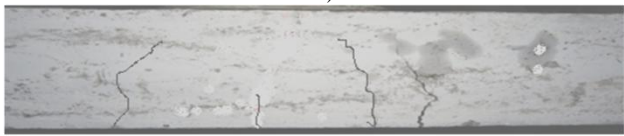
Beam - Wsc2 (Single layered welded wire mesh with concrete core)
